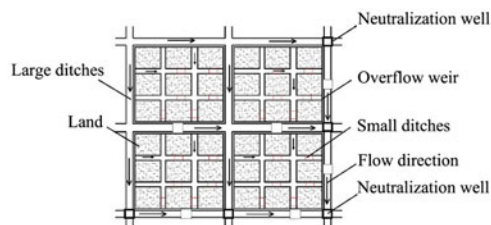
Layout II trapezoidal terrace land: Setup of neutralization well at the middle of the ditches.
